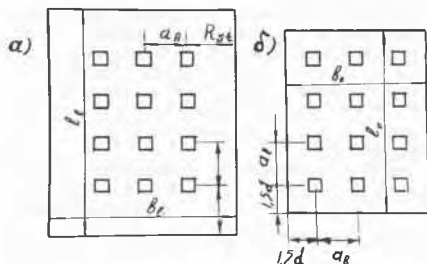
Layouts of compression distribution in the plane of pile point; a-plan, b-section
